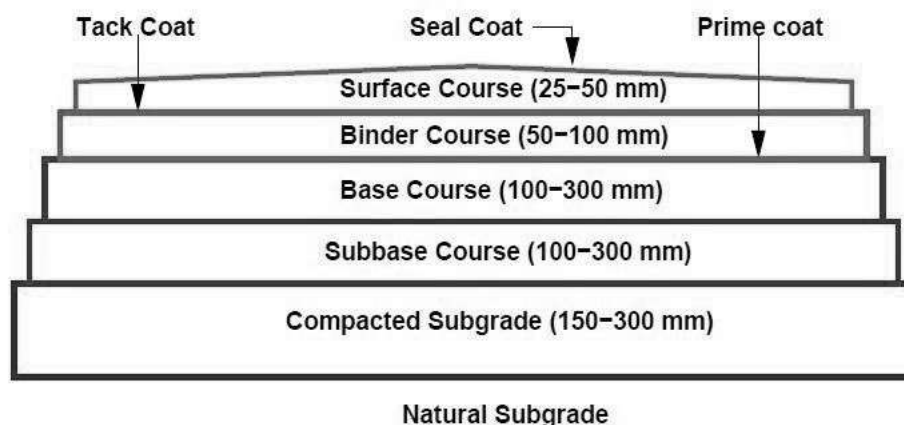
Typical cross section of a flexible pavement (Mathew, 2009)
